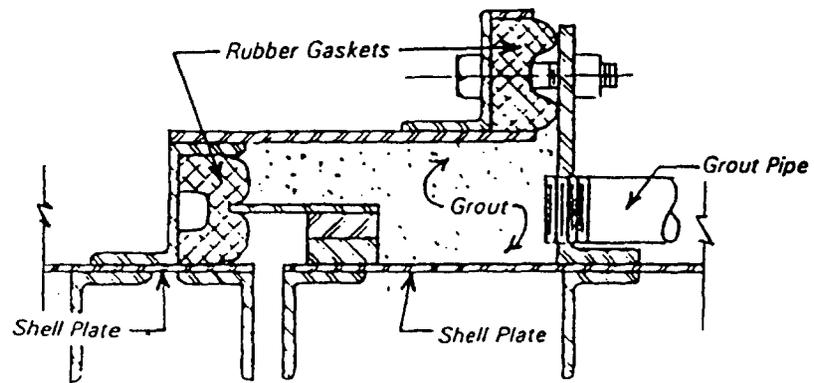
Joint detail for the Detroit River Tunnel (1910).
